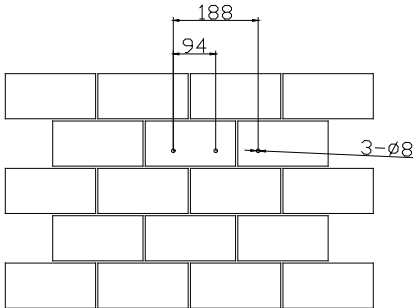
Drill hole dimensions of R5-0.7K/1K/1.5K/2K/2.5K/3K-S1
